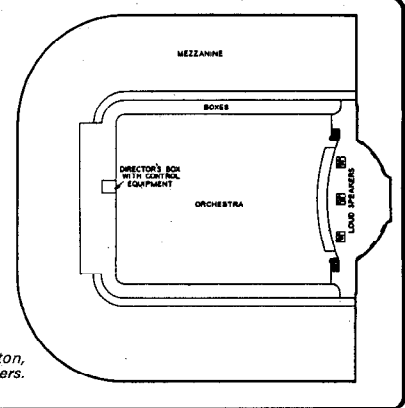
Floor plan of Constitution Hall, Washington, D.C., showing locations of loudspeakers.
